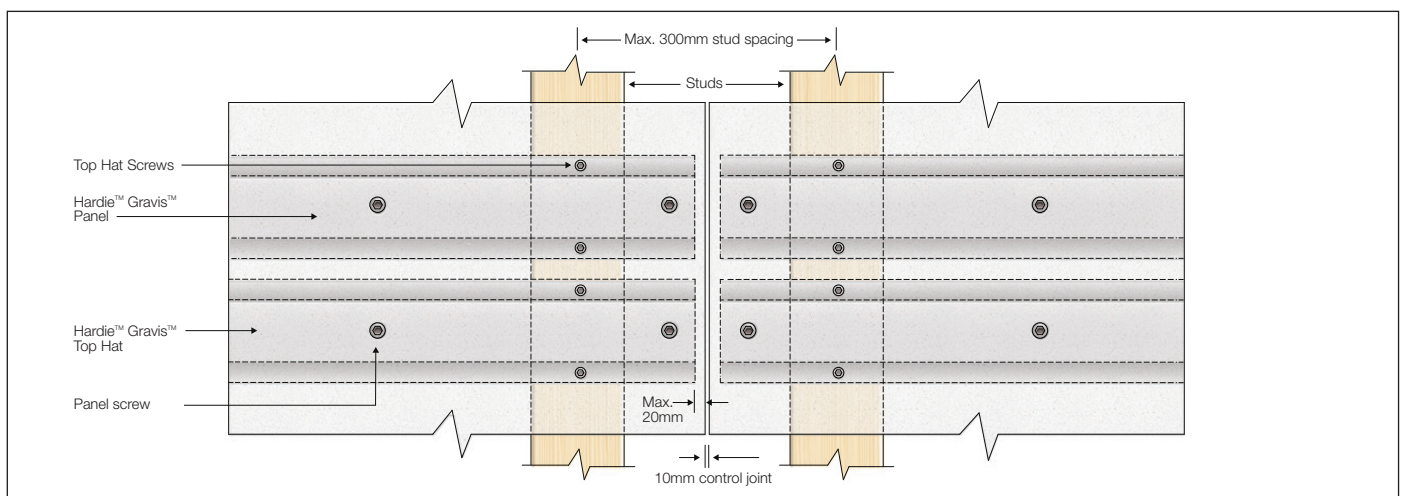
ZERO LOT WALL TYPICAL VERTICAL CONTROL JOINT - OPTION B
